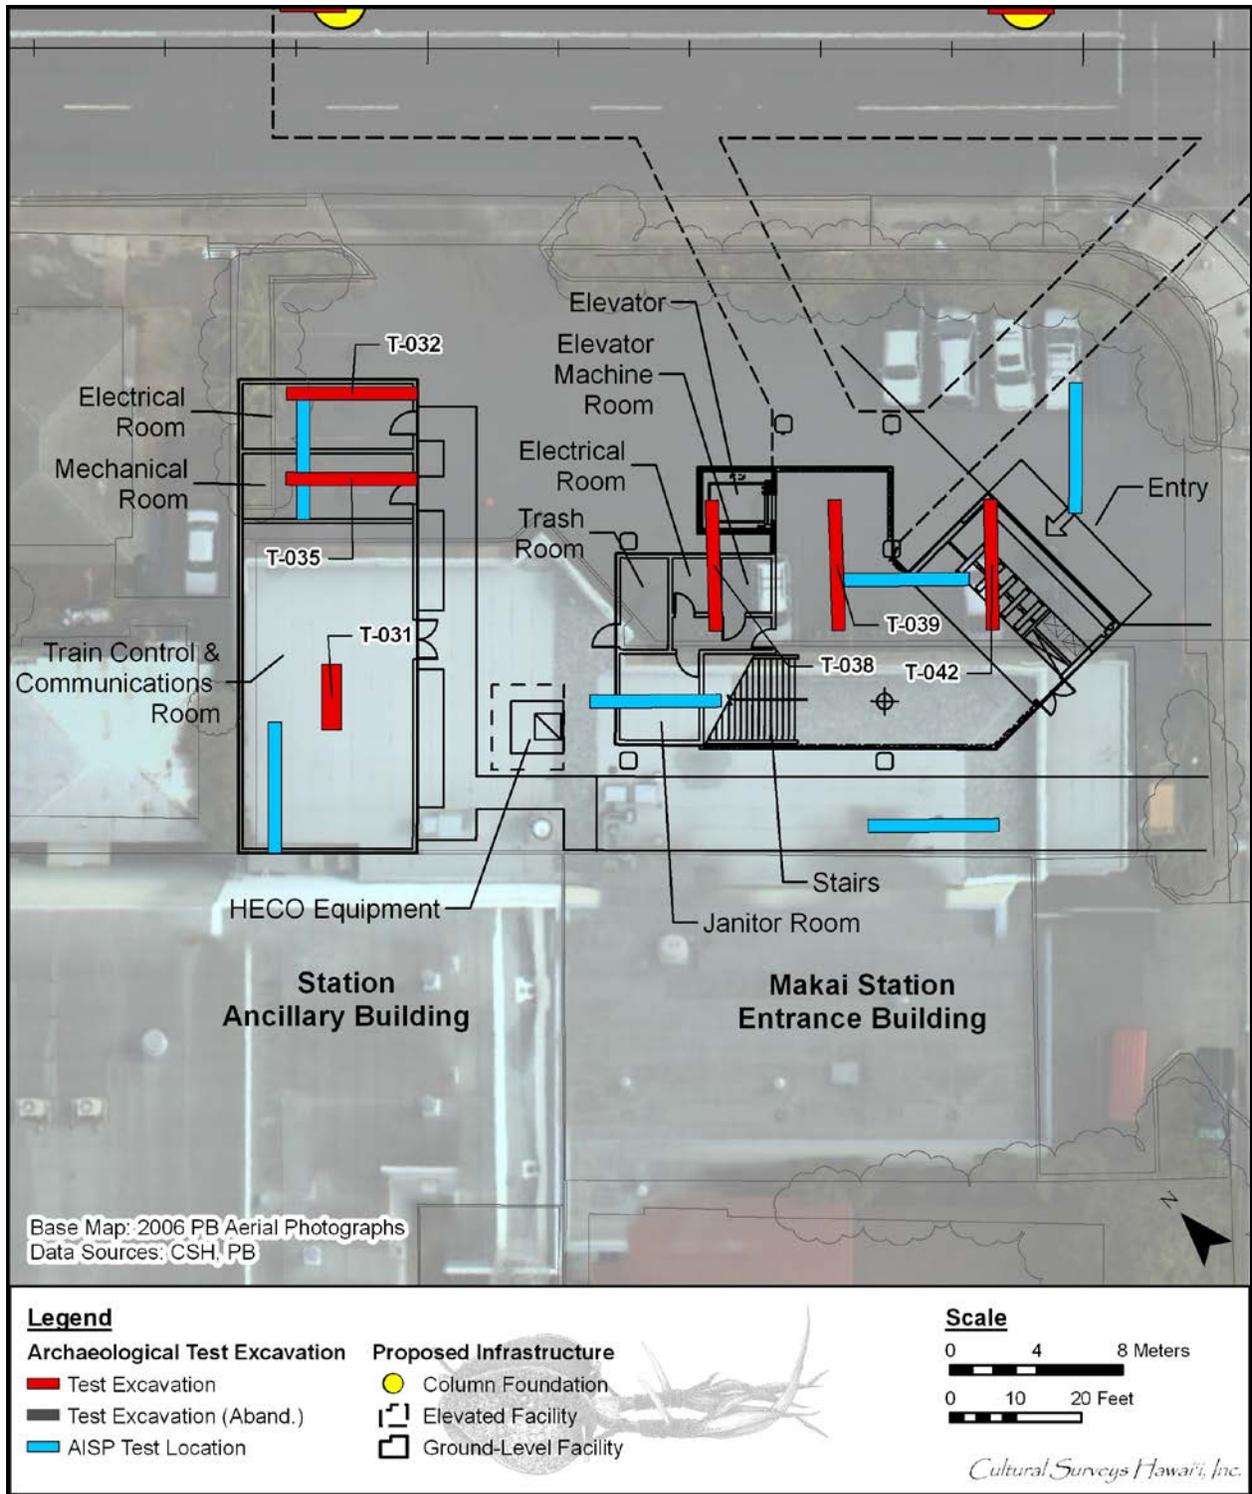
Kalihi Station, detail of (makai) Station Entrance Building showing locations of proposed AISP and actual AIS test excavations
